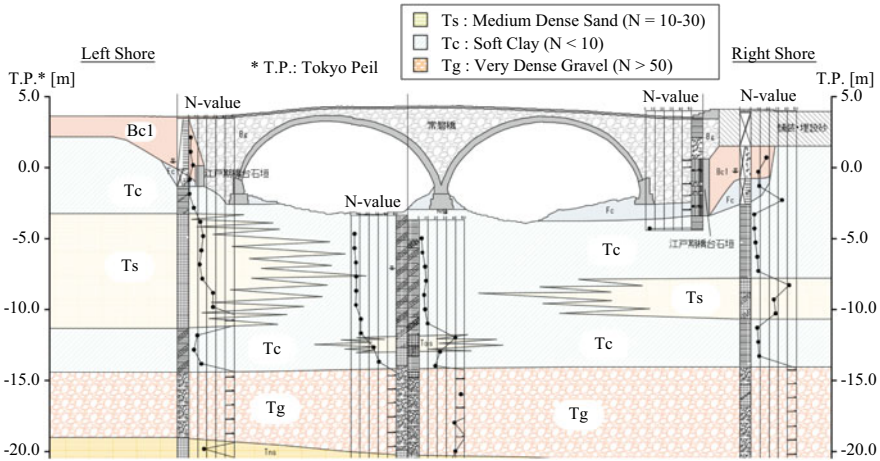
Subsurface stratigraphy at Tokiwa Bridge site
